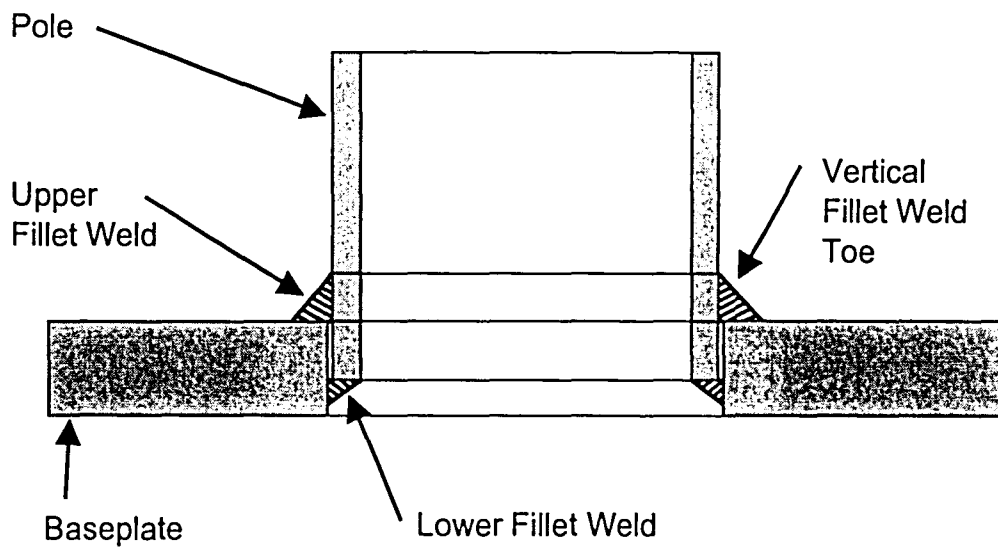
Schematic Cross Section Through Socket Welded Connection
